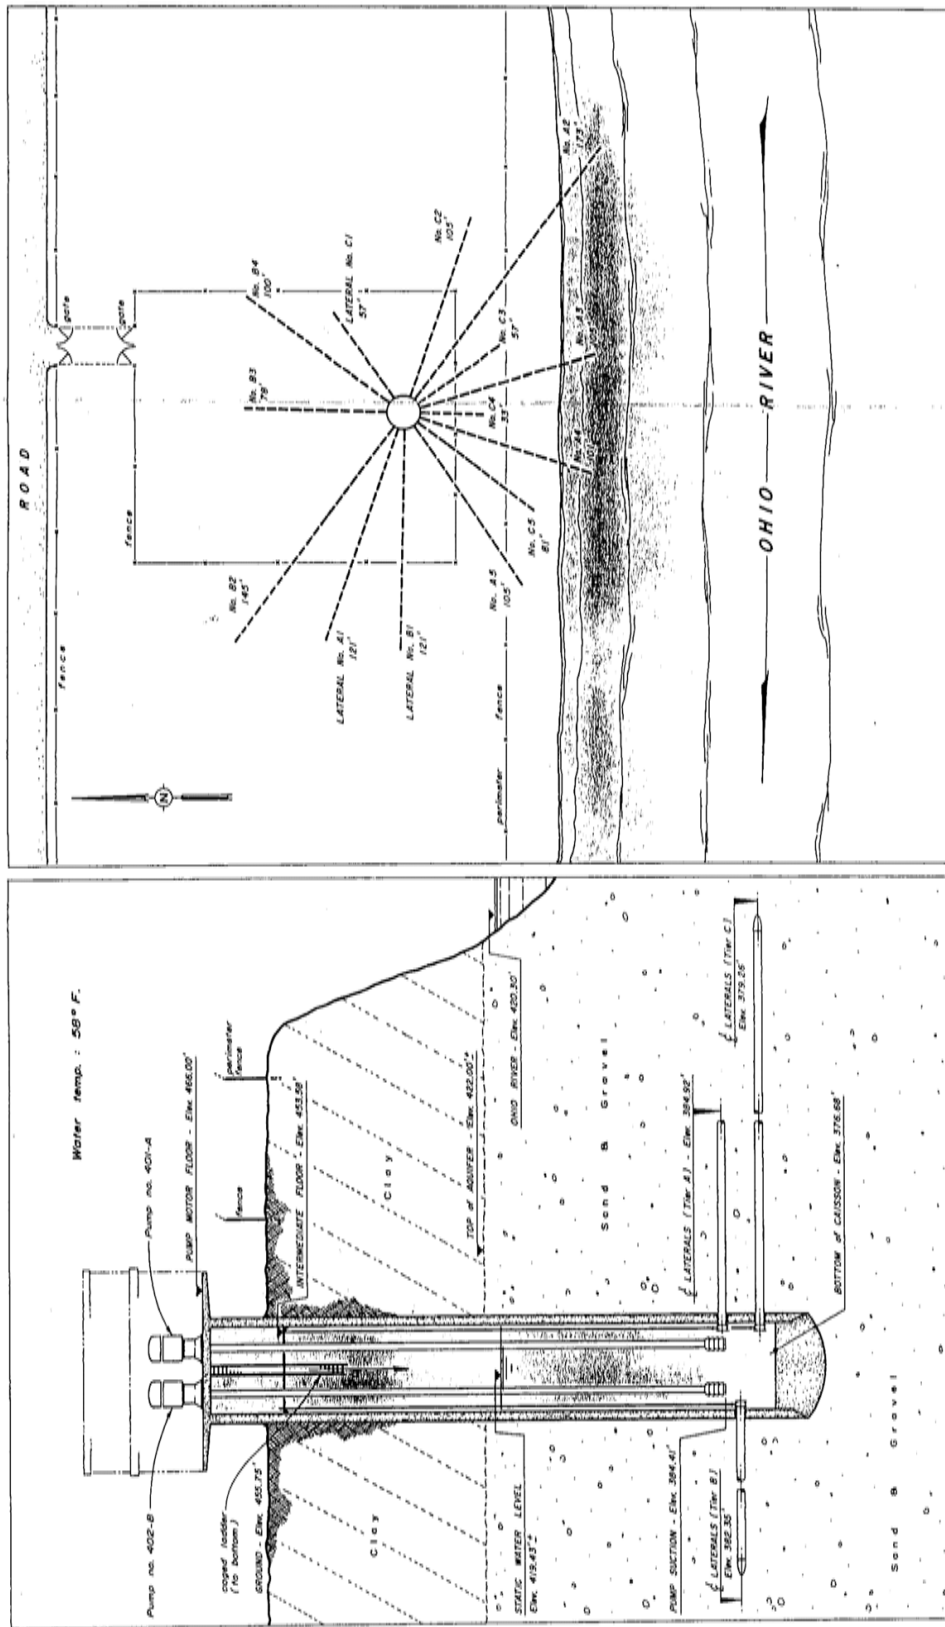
CW-2 Plan & Section (Ranney, 1979)
